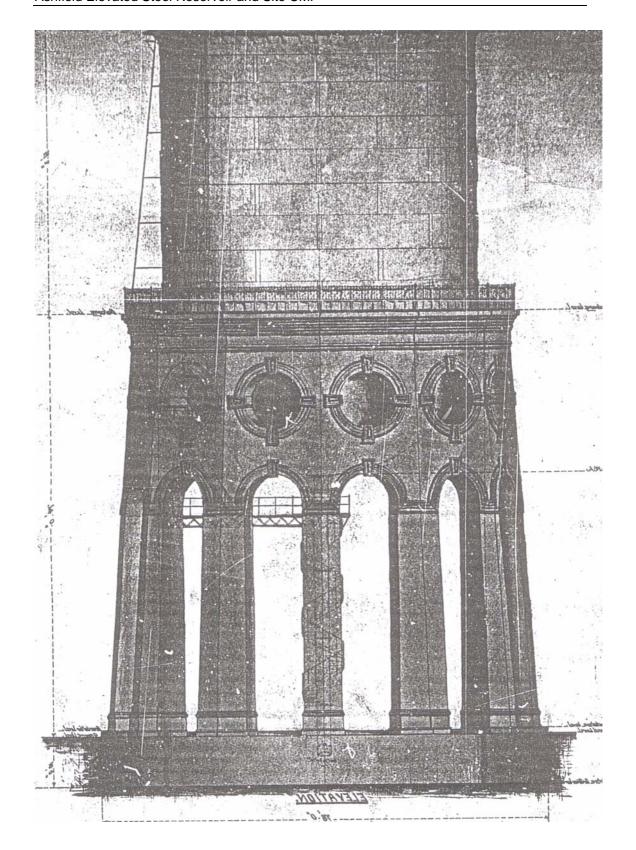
Early design for Ashfield 'Proposed 1,000,000 gallon steel tank on brick in cement & concrete tower for Ashfield, 1908.
